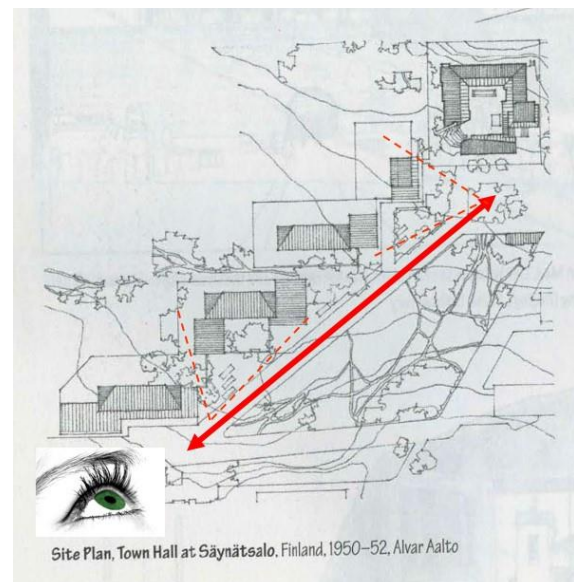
Site Plan. Town Hall at Säynätsalo, Finland, 1950-52. Alvar Aalto
